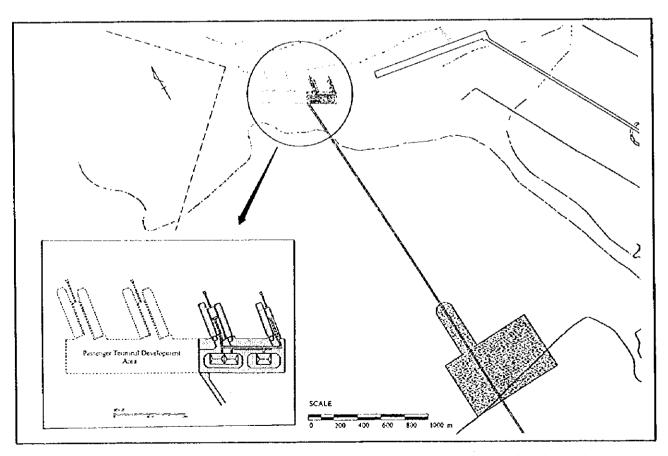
General Layout Plan of Ferry Terminal (5,000 GRT, at Surabaya site)
